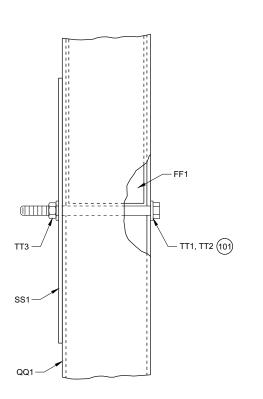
DETAIL "B" STEEL PIPE ASSEMBLY (BEAM GUARD AND W BEAM END SECTION NOT SHOWN)
